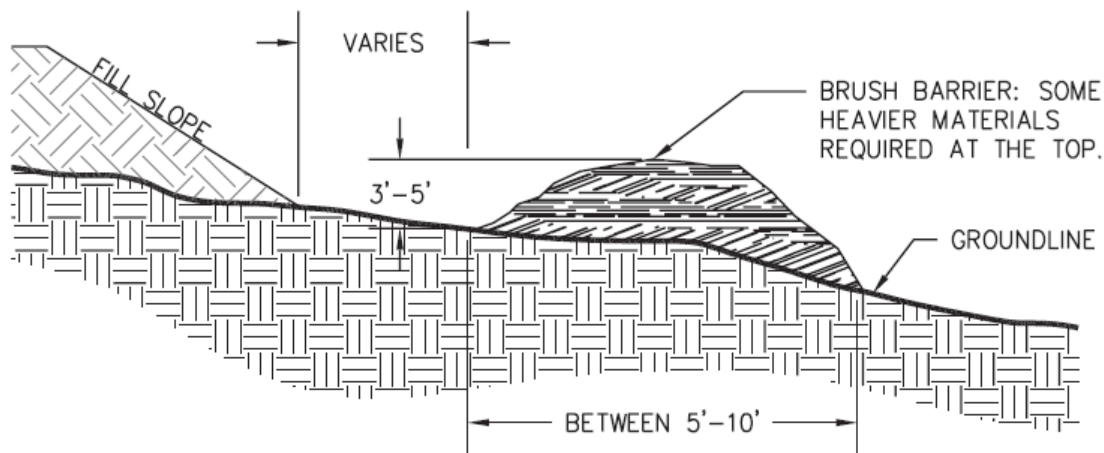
Brush barrier installation detail. ([GSWCC 2016](#))
